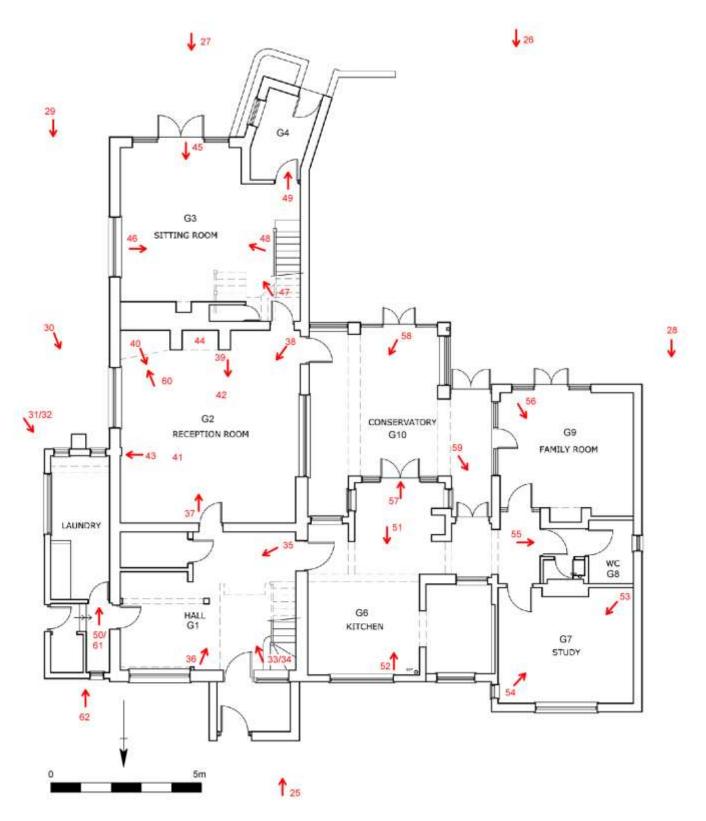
Ground floor plan showing photo locations (scale 1:125)
